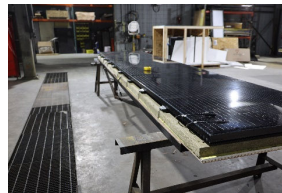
16-ft PPT setup preparation for γ -4mm cavity-wall façade setup.
